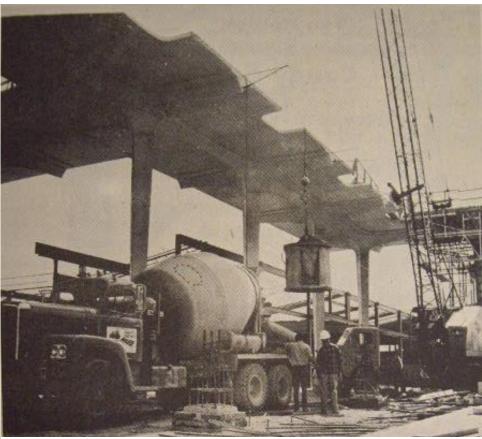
(Above) Caption reads: "CONCRETE WORK—One of the thousands of construction jobs going on at Southcenter, with the four major stores now underway, is pouring the hundreds of cubic feet of concrete, here for the tall columns and windowed roof which make up the main plaza. Three fountains and landscaping will be incorporated into the walkways and various shoppers' resting points in the giant shopping center."
